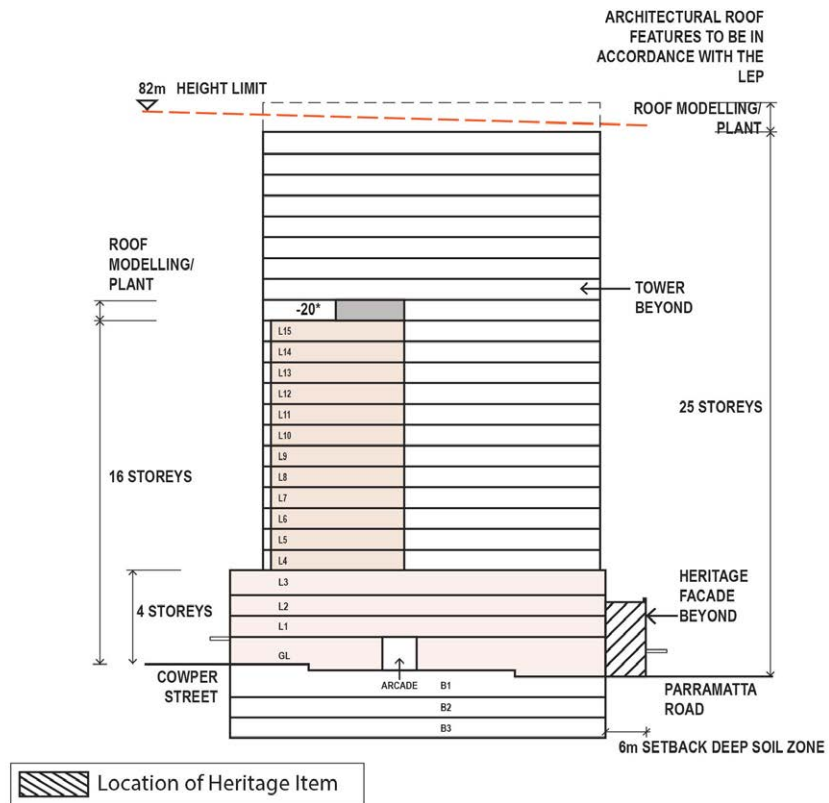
Building envelope section C-C (*final height of tower to be determined through the Design Excellence process)
